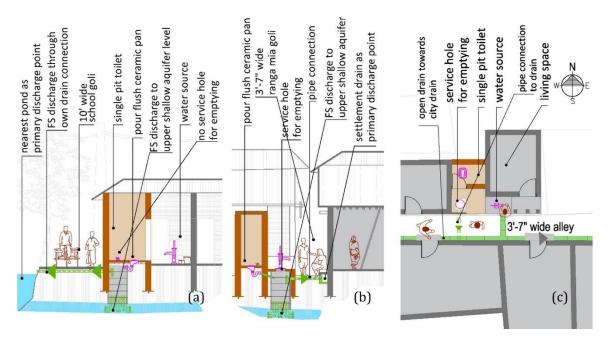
FS discharge from pit toilets (a) Single HH pit section; Shared pit (b) section (c) plan
